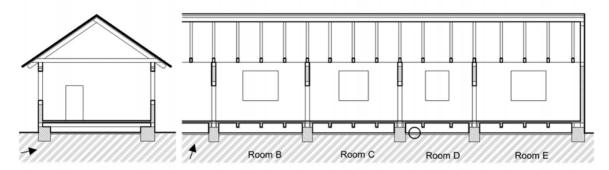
Drawing reconstruction of the excavated house built directly on its ground plan. This reconstruction works with a hypothesis of an elevated wooden floor placed on the stone foundations (however, with necessary support); another possibility would be placing the wooden beams of the floor directly on the ground lined with pebbles which would require no additional support. Notice the terracotta water tube running in parallel to the western wall of Room D. Reconstruction by B. Janů.
